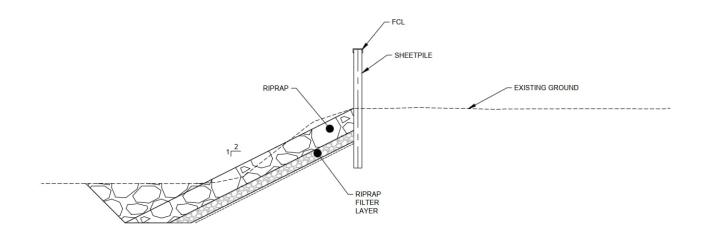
Narrow Dike (Sheet Pile Wall) Section
